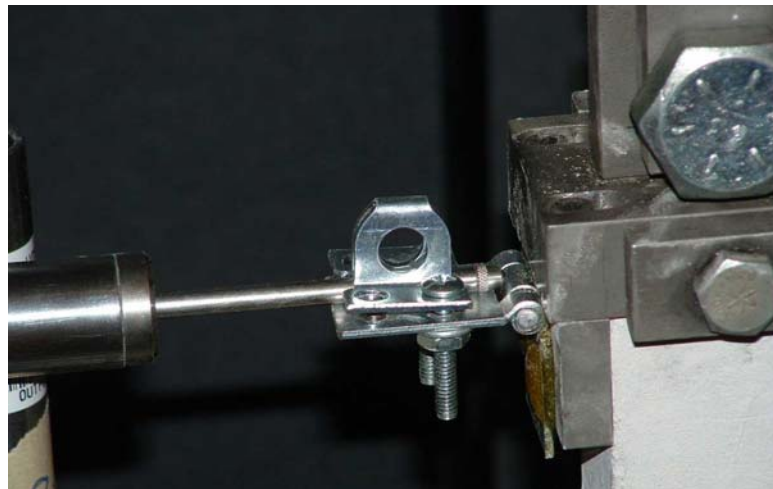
Articulation Between Loading Cap and Horizontal LVDT for 5-mm R/C DHFRP Columns.
